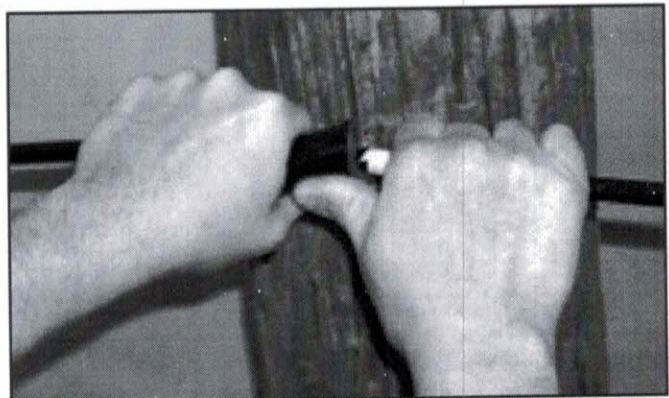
MINIMUM THROUGH-BOLT CLEARANCE
